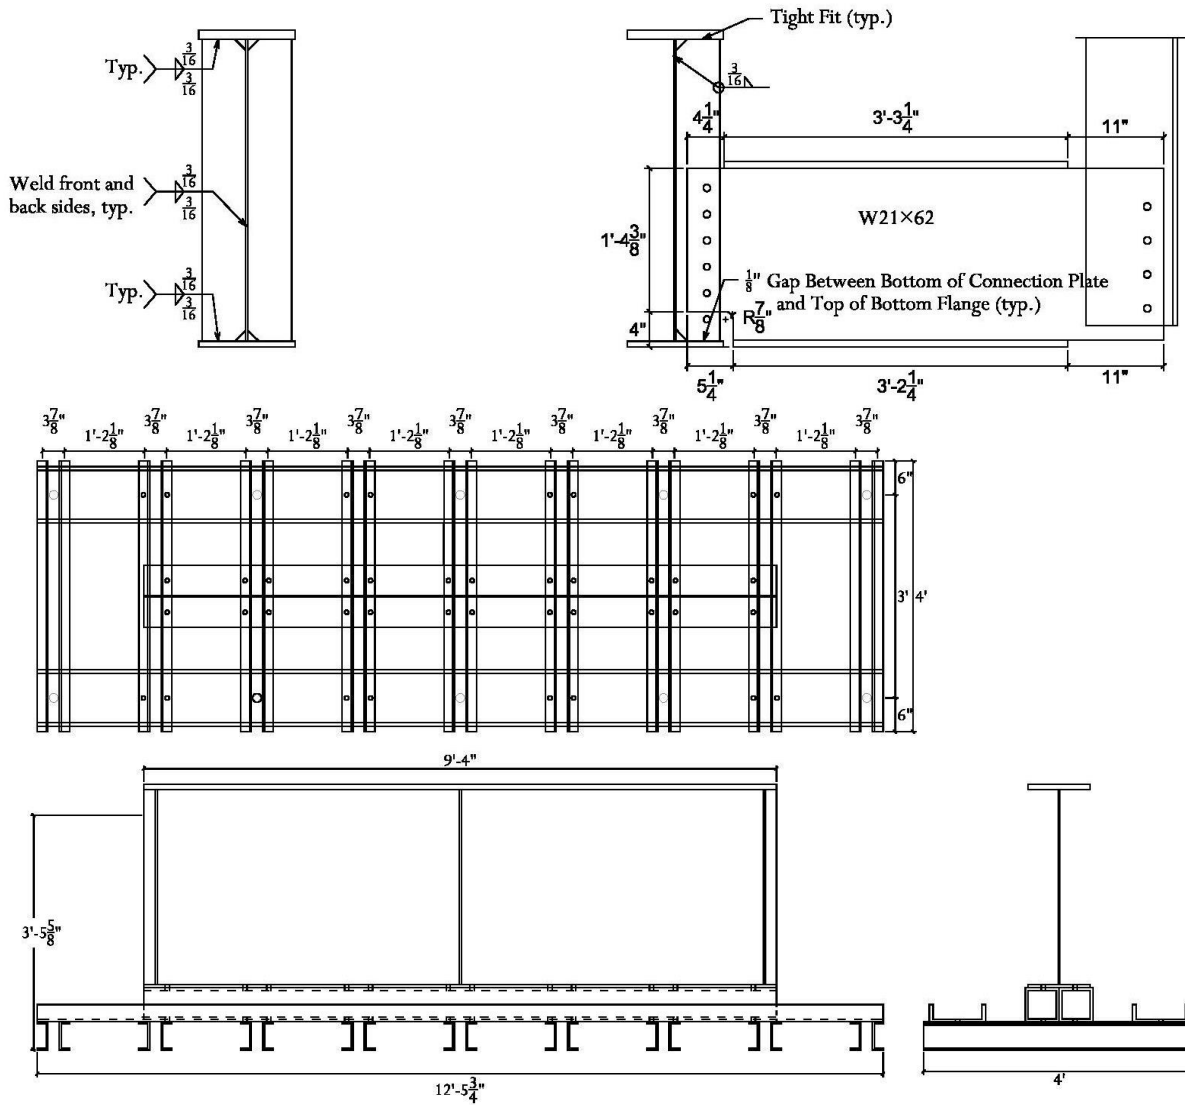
Specimen dimension and layout of single-plate connection specimen (Test FS1)
